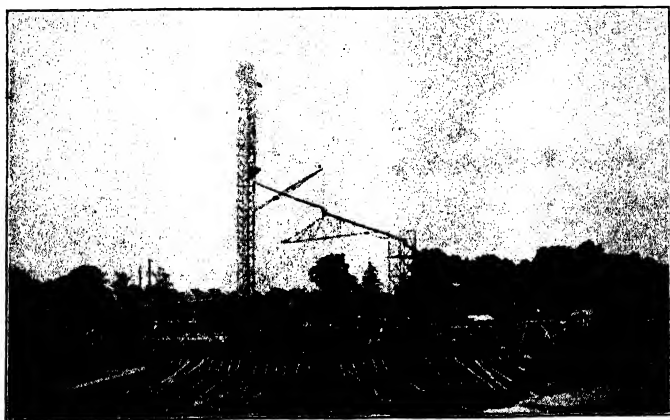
Plant for chuting concrete at hospital building, University of Iowa.
